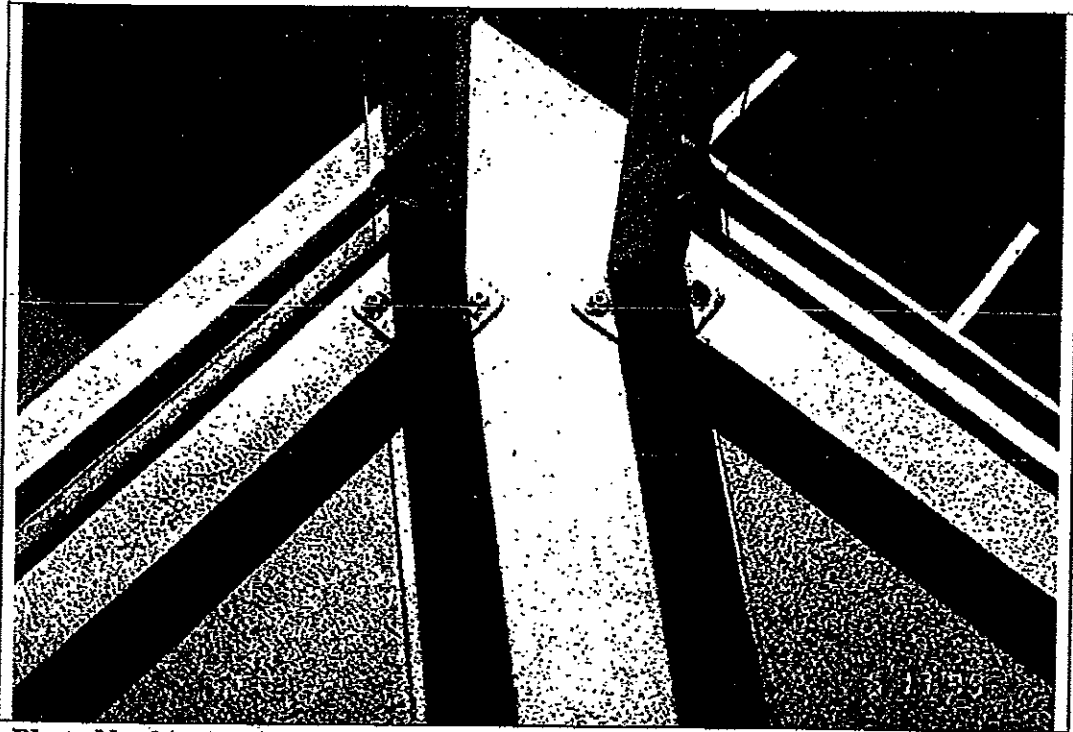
Typical location where the balcony guardrails are secured through the vinyl membrane.
